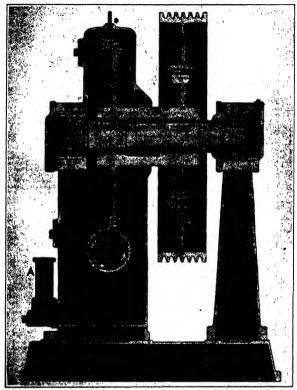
Cross-section through V-grooved, geared type traction machine.
